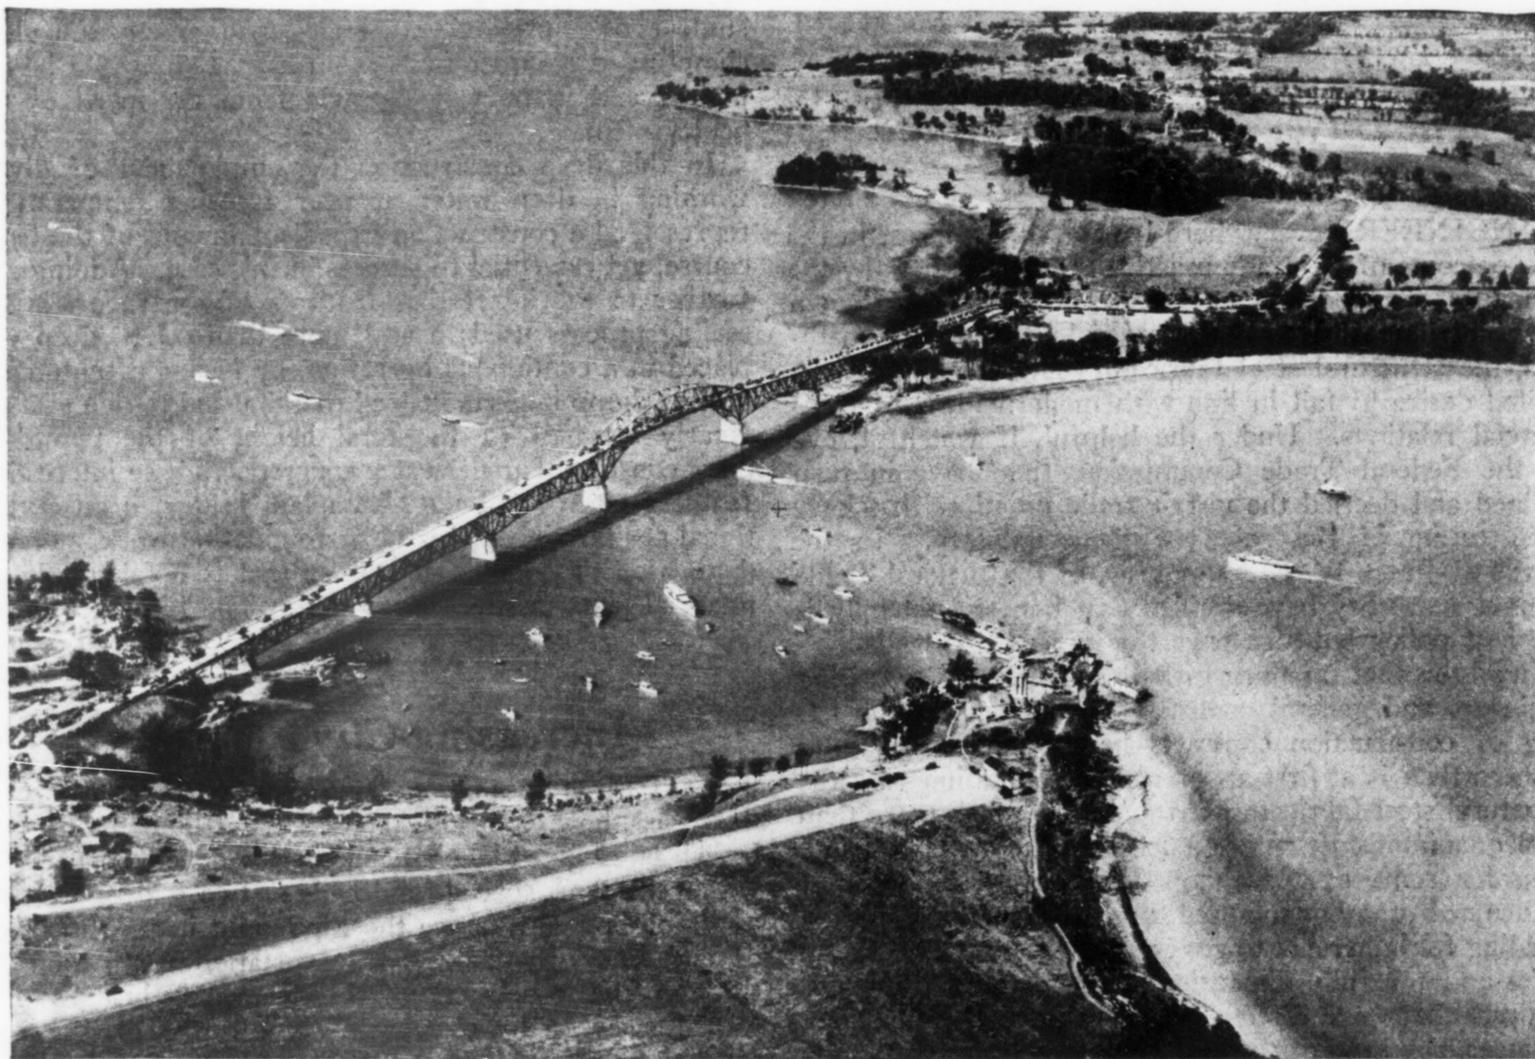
AIRPLANE VIEW, LAKE CHAMPLAIN BRIDGE
